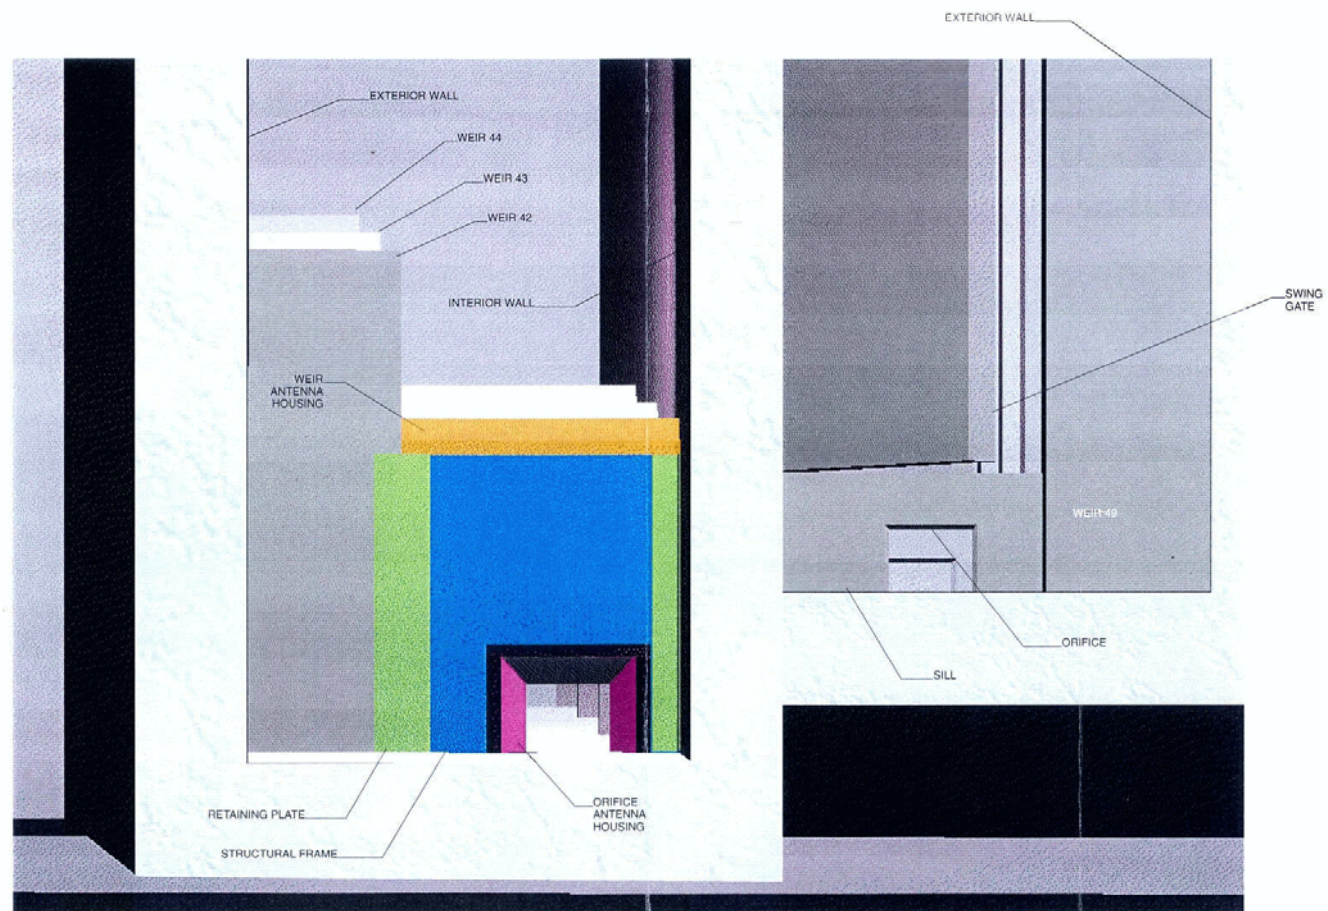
Antenna Housing Installation - Looking North from Just Downstream of Weir 42
